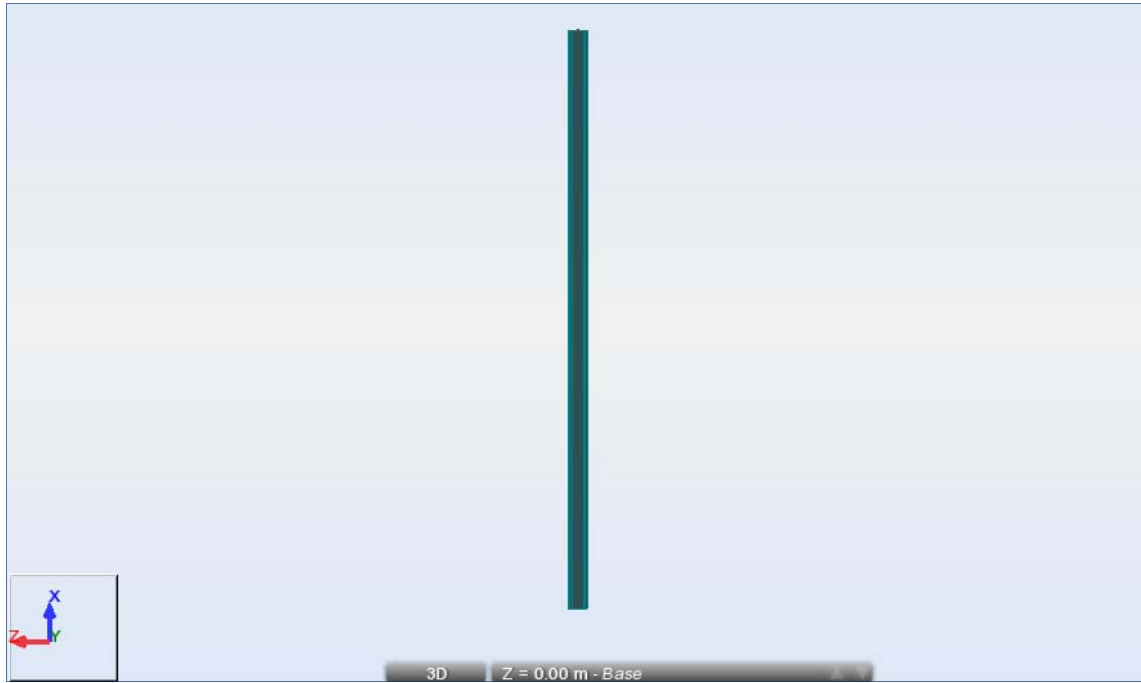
Structure 1 layout through exporting from RVT to RSA via CIS/2
